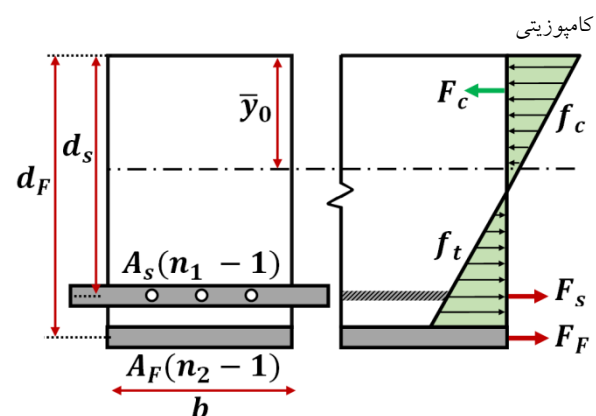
uncracked (perfect) section of reinforced concrete beam strengthened with composite sheet
